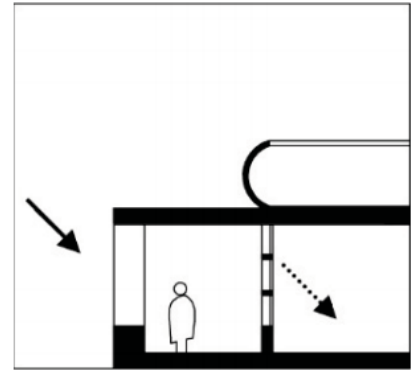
Contained openings of José Gomes Ferreira Secondary School – Section over openings
